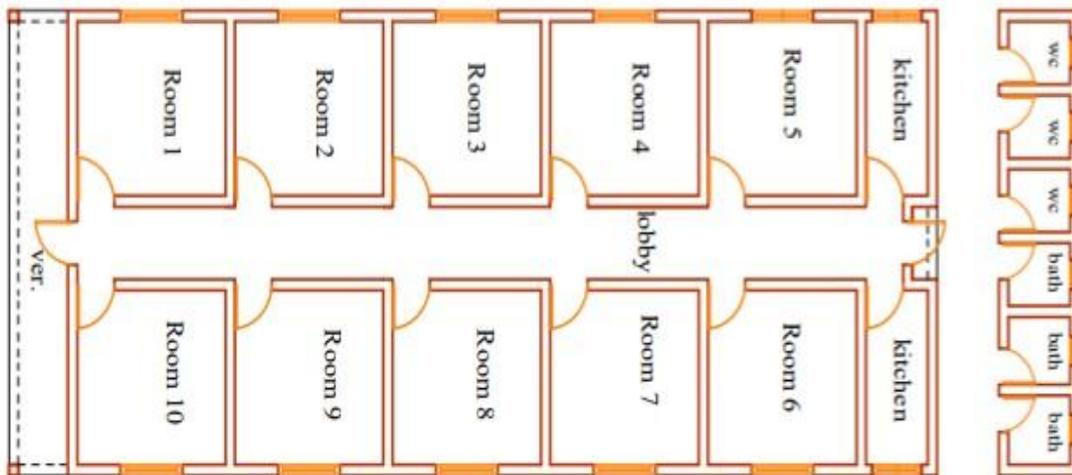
Tenement building in Allahu Lateef area Ede, Nigeria
